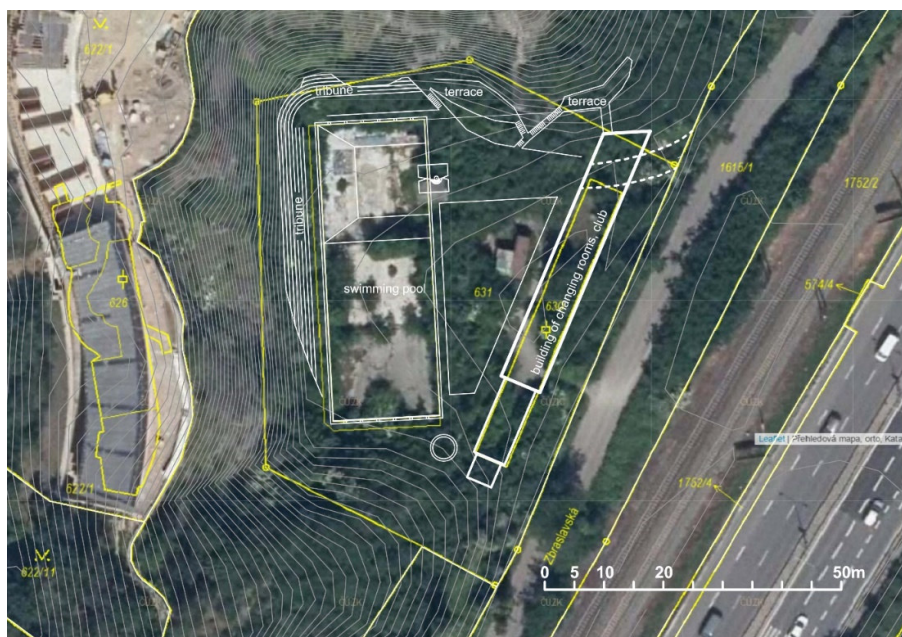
Site plan of the swimming stadium: recent aerial photo showing the recent state, approximate drawing reconstruction of the 1930s state (white colour), land registered plan with the plot borders outlined in yellow, and the topography outlined in grey.
